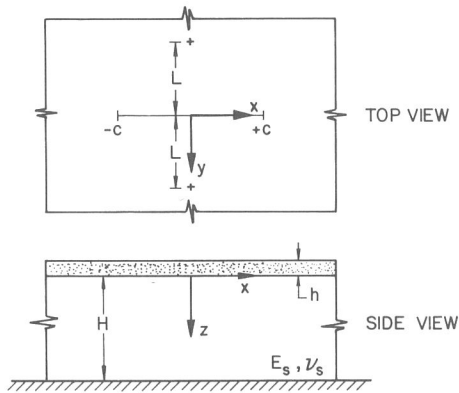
A Cracked Plate on a Single Layered Foundation
